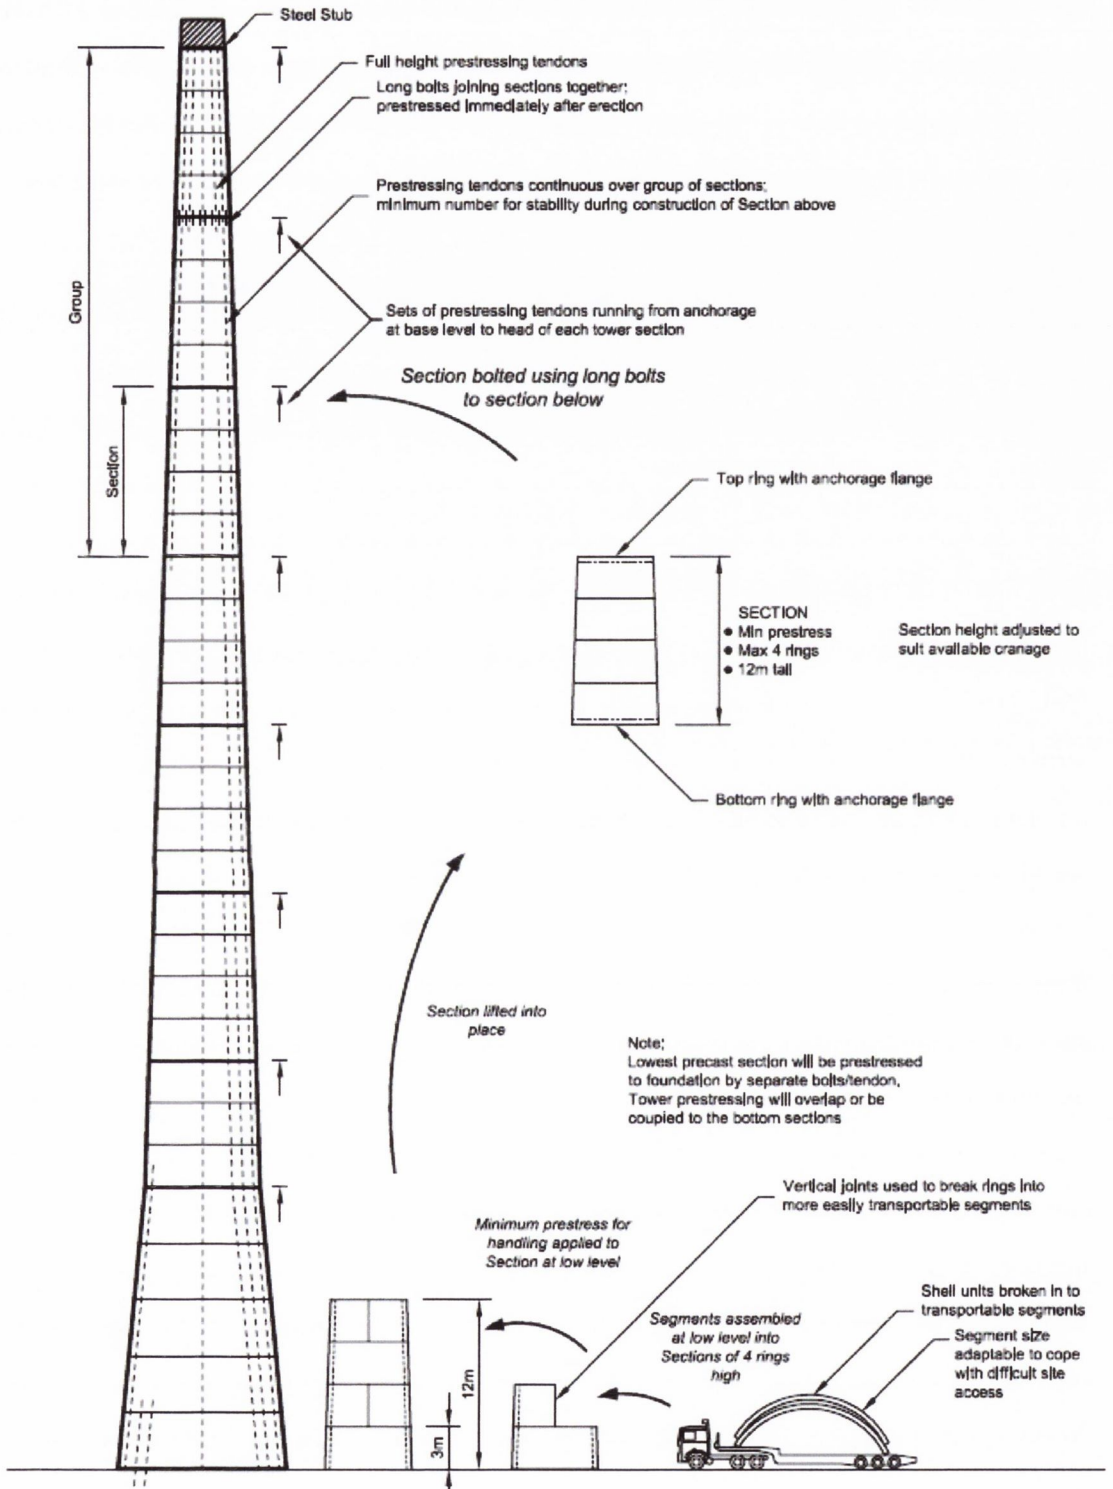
Precast concrete wind turbine tower - example construction sequence (Tricklebank *et al.*, 2007).
